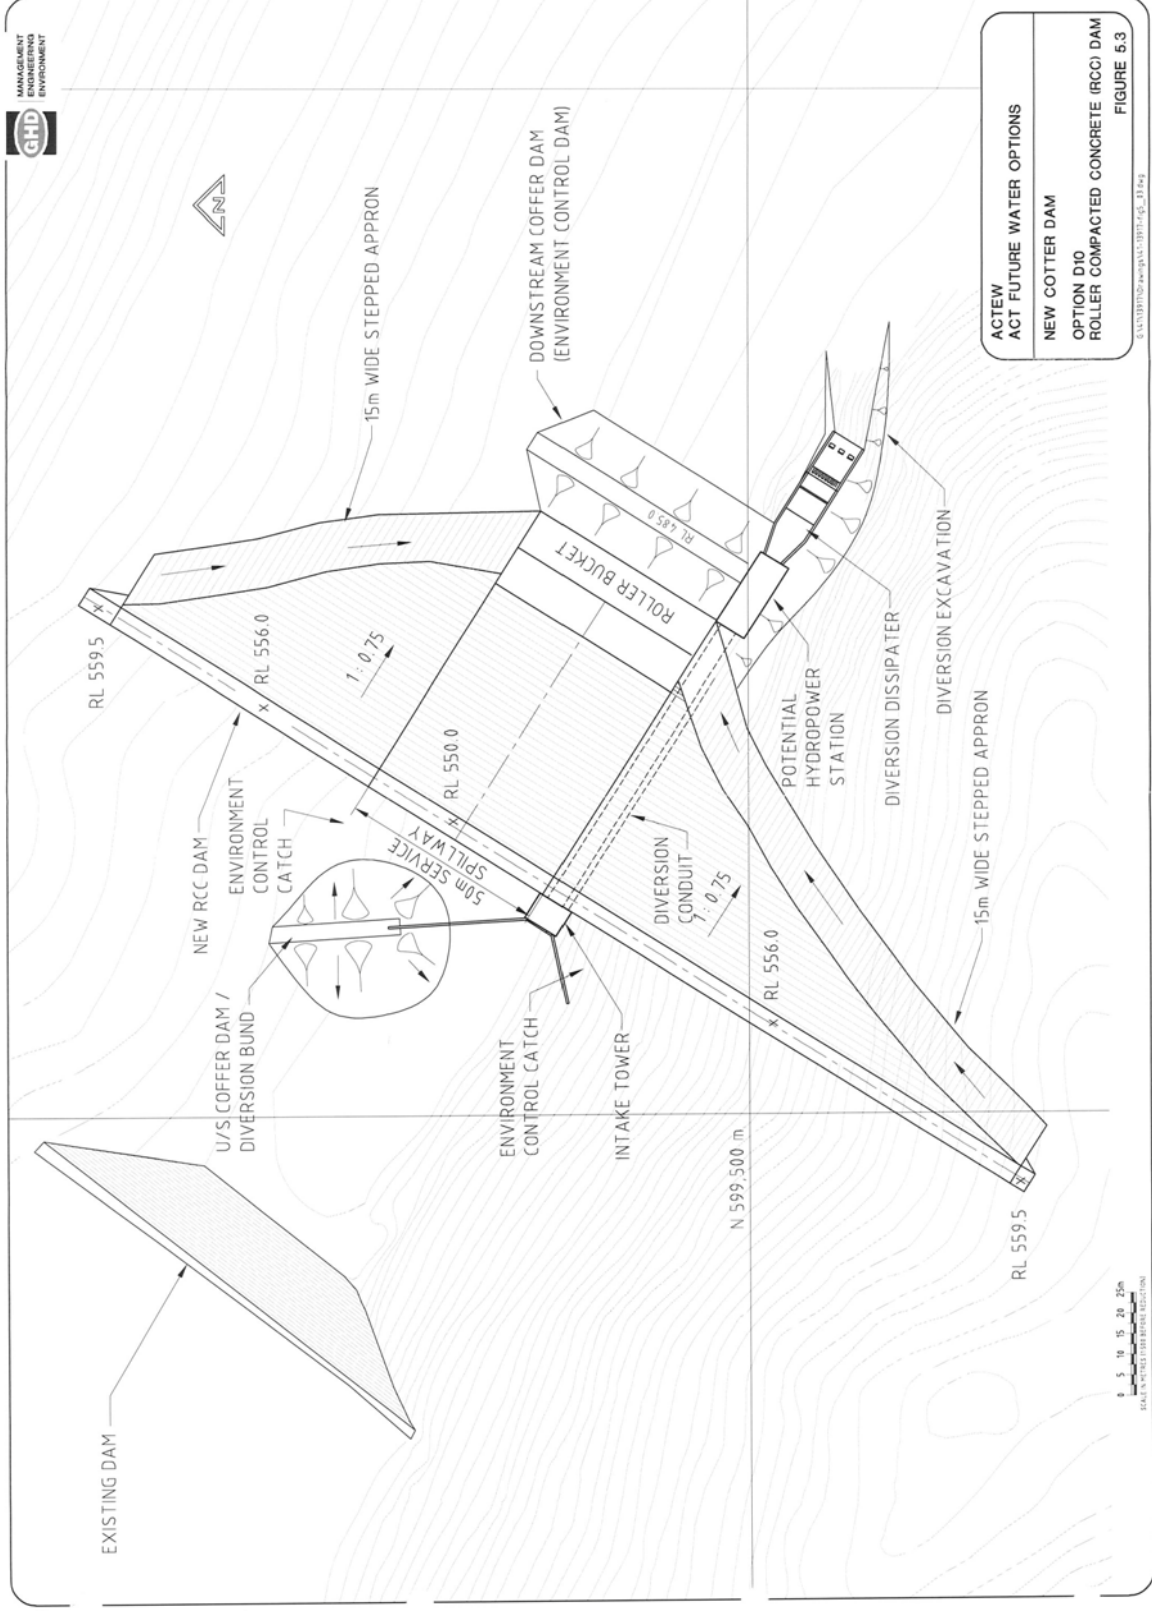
RCC Dam – Plan (ex GHD 2005)
